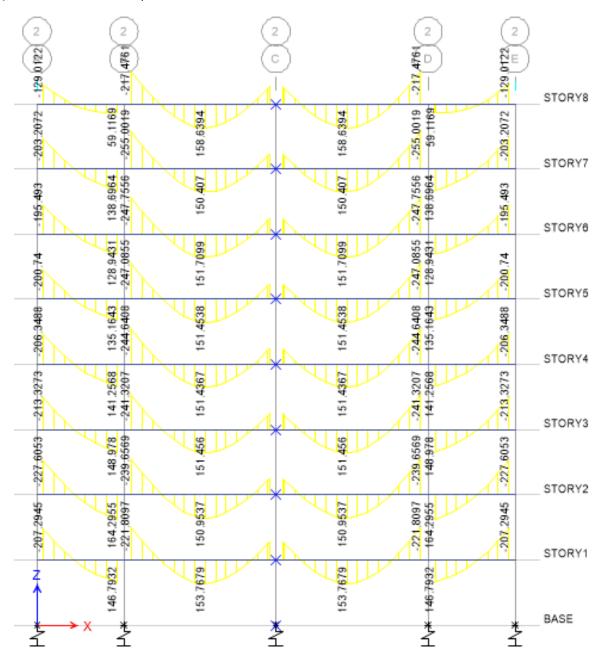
7. Effort diagram of the fundamental grouping for the central longitudinal frame isolated foundation model ks shrunk.
